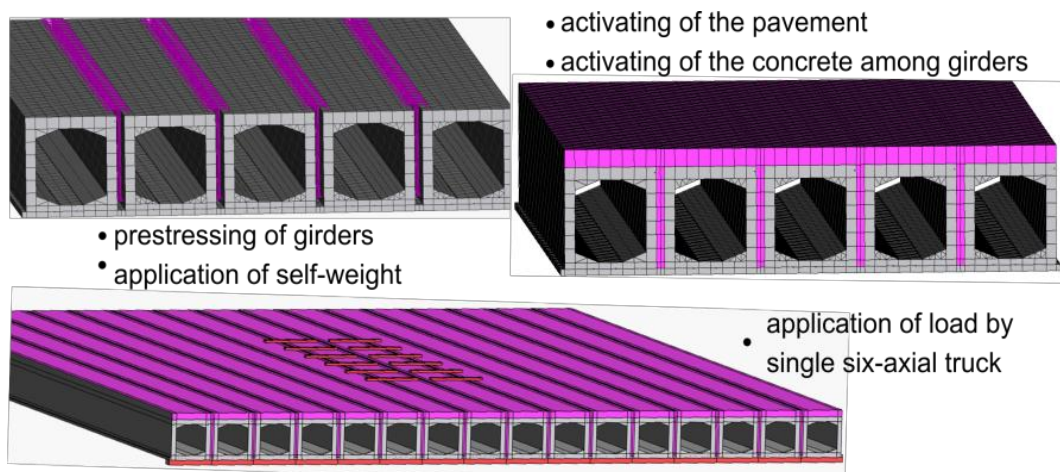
Construction process (3 steps) of the bridge consisting of 16 girders KA-61
